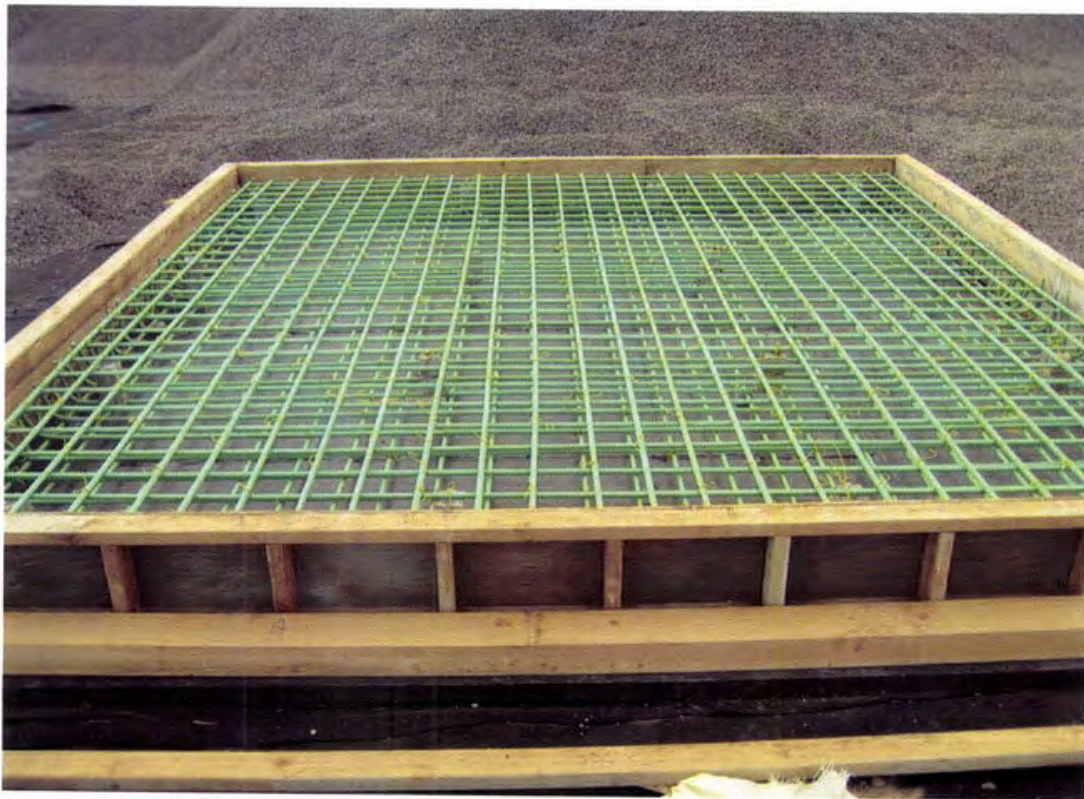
#5 epoxy coated rebar are placed in accordance with Detail 1 of Drawing 13
